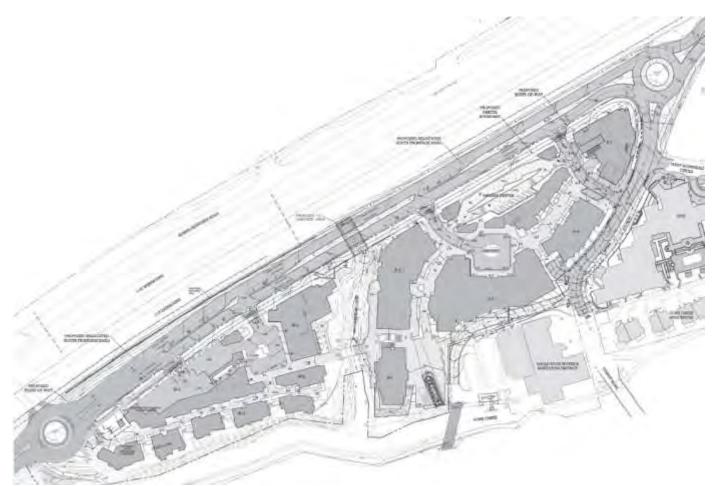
Conceptual Grading Plan for Frontage Road Realignment
